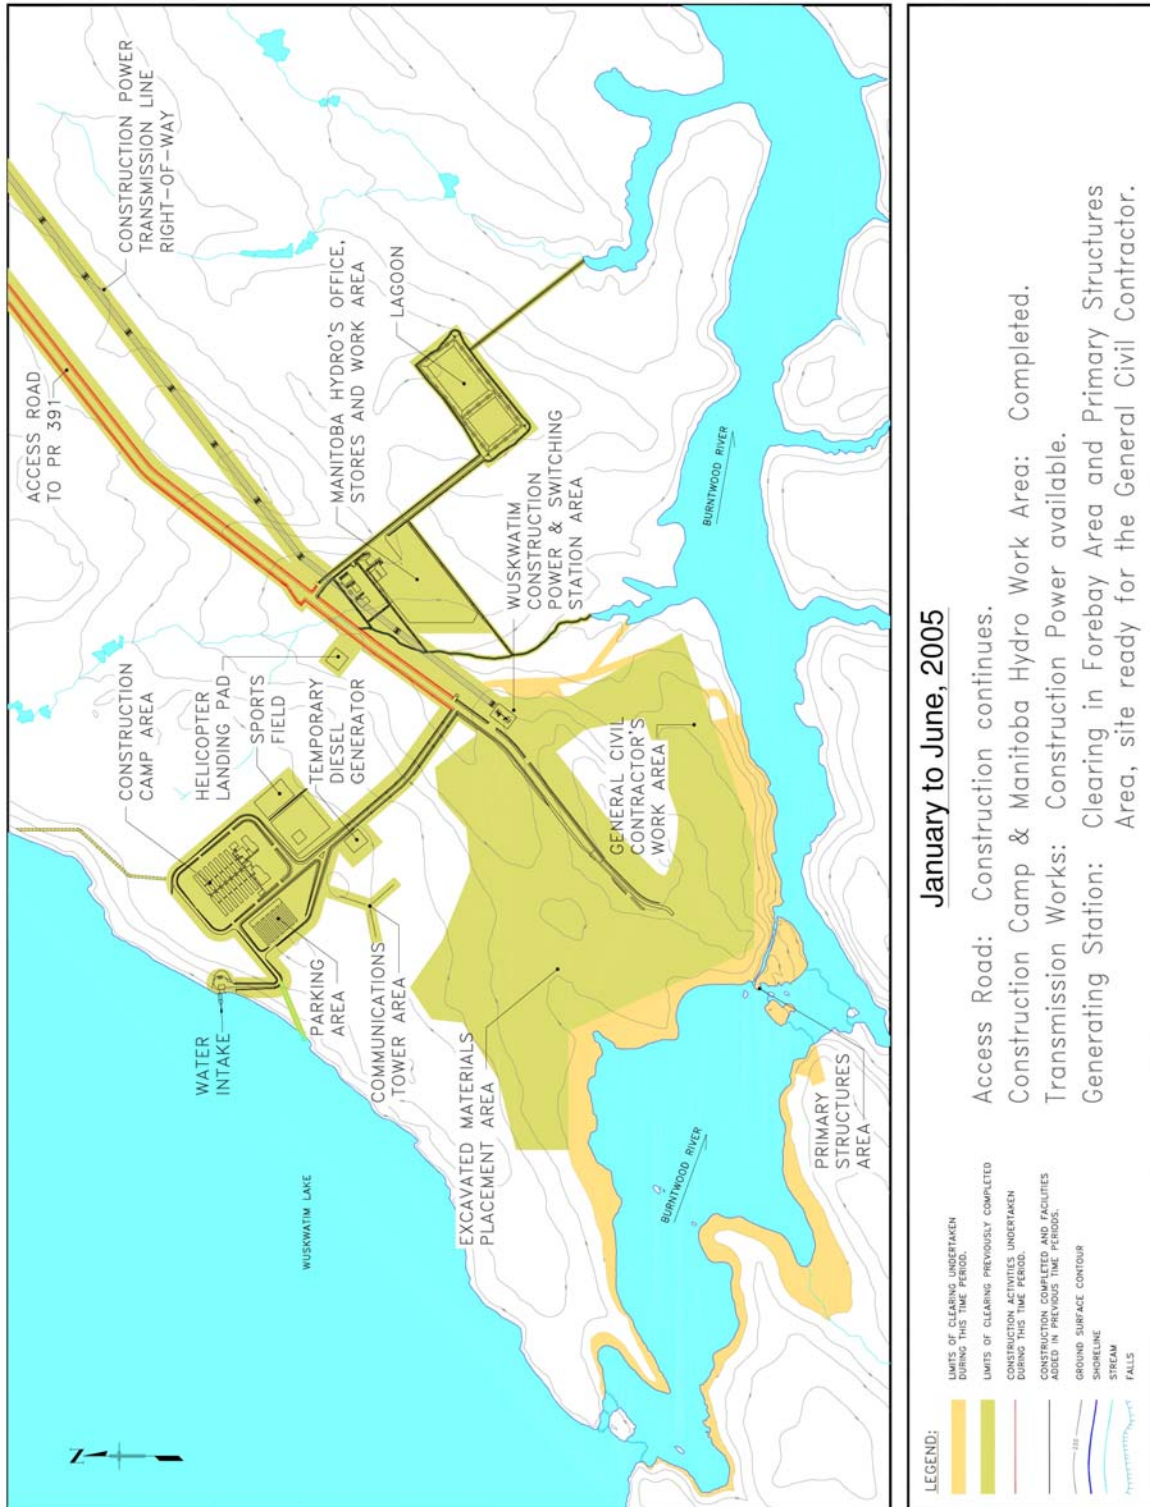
Proposed Construction Activities - January to June 2005
